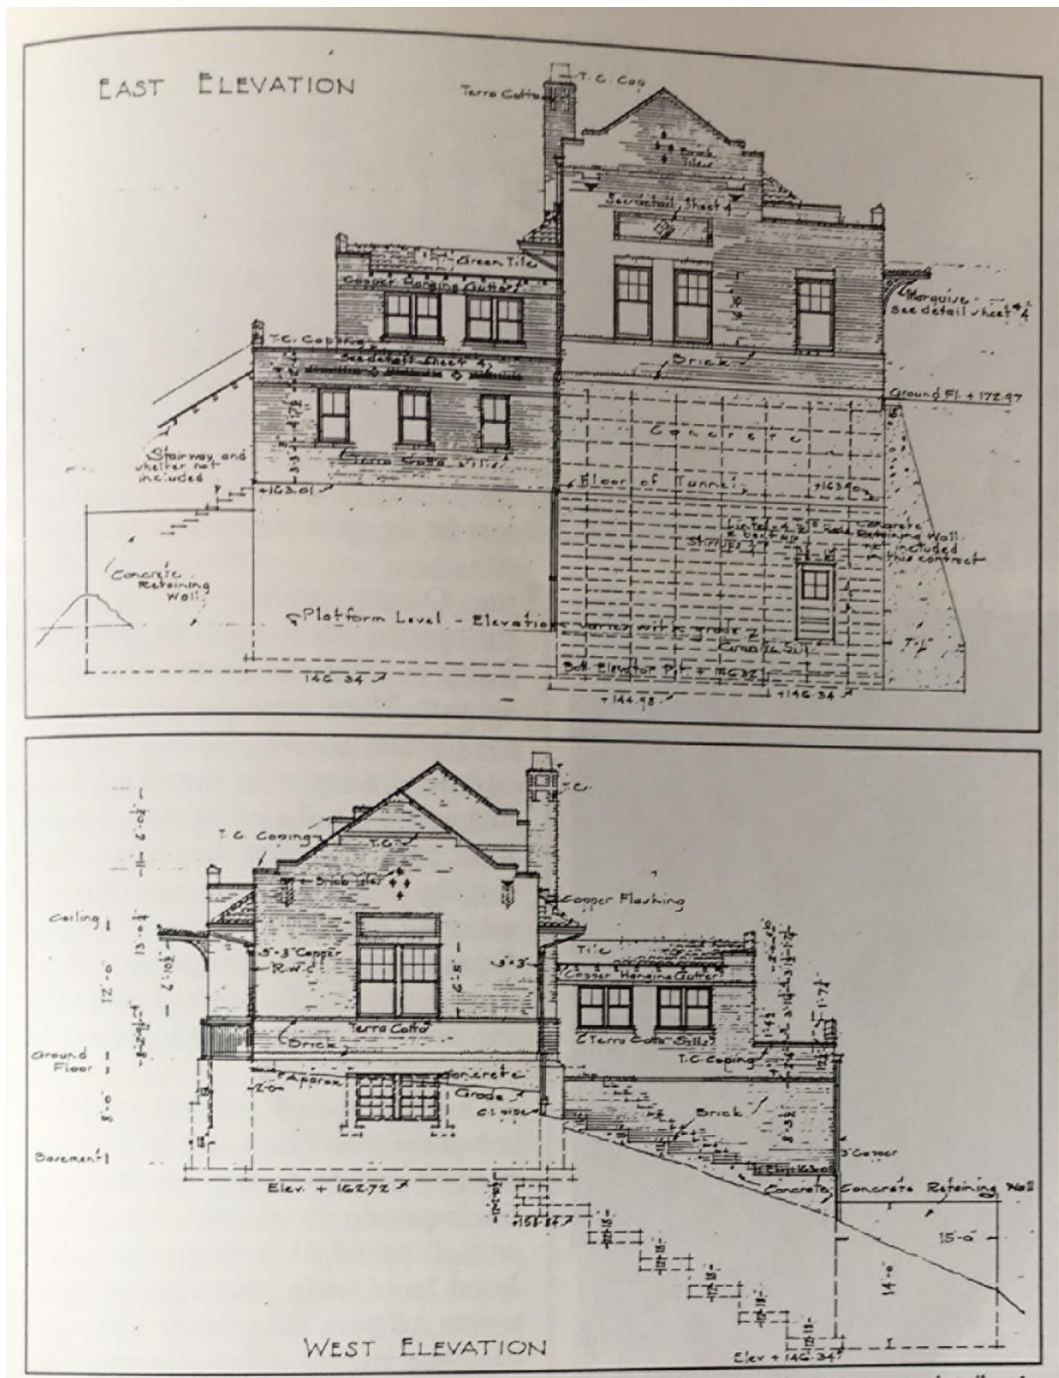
Revised elevation drawings by PRR Architect William Holmes Cookman for construction of the Edmondson Avenue Station. Note the original rear extension and the covered staircase suggested in the East Elevation, which descended to track level. Baggage carts accessed the elevator and were wheeled along the platform, crossing the tracks at grade for northbound trains. Wrabel, "Terminals, Tunnels and Turmoil: The History of Pennsylvania Station – Baltimore," *The Keystone*, 35.
